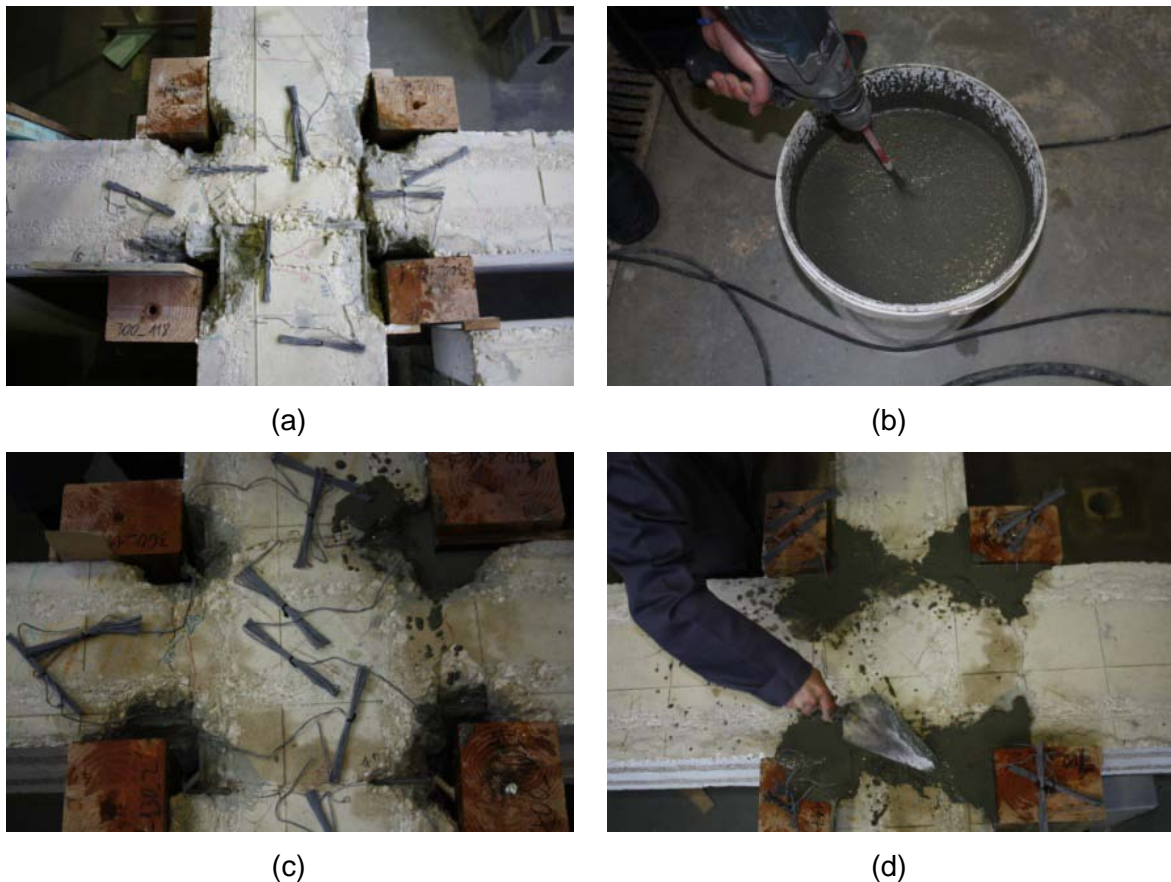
Joint reconstruction: (a) formwork; (b) grout preparation; (c) filling the formwork with grout; (d) surface regularization.
